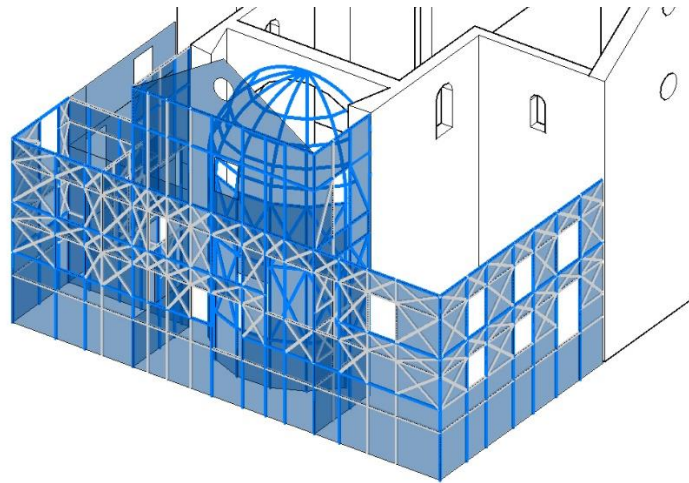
Layout scheme of the *timber-Baraccato* walls
